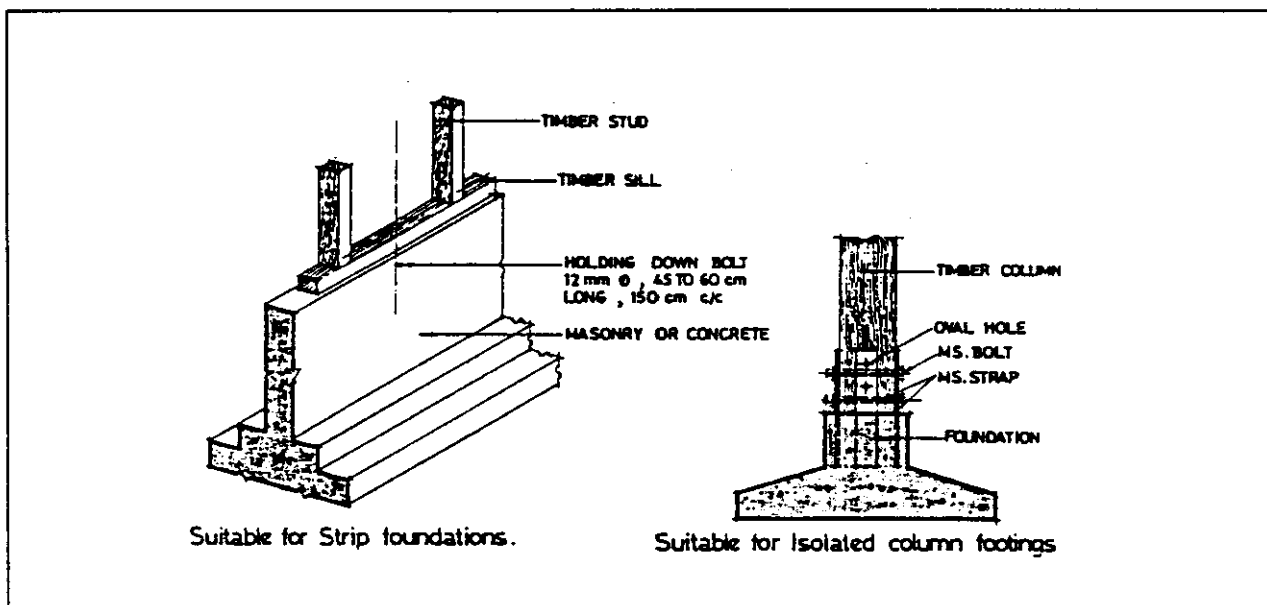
Details of Connection of Column with Foundation [1].
